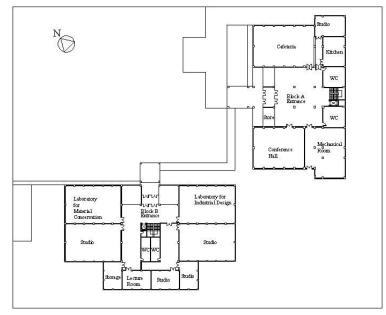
The schematical plan showing Block A and Block B. (Source: the Department of Restoration Archive, İYTE).
